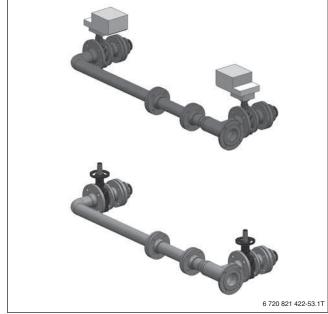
Flue header assembly with motor-controlled hydraulic butterfly valve
